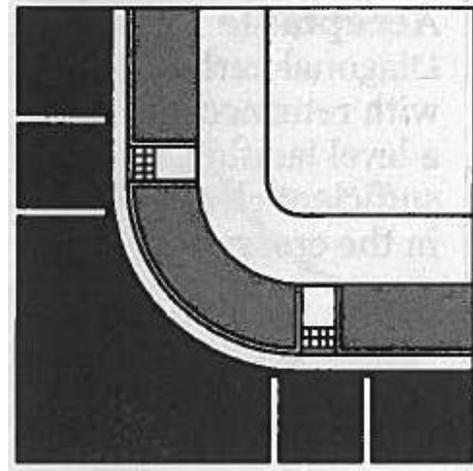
General Recommended Curb Ramp Design and Placement
